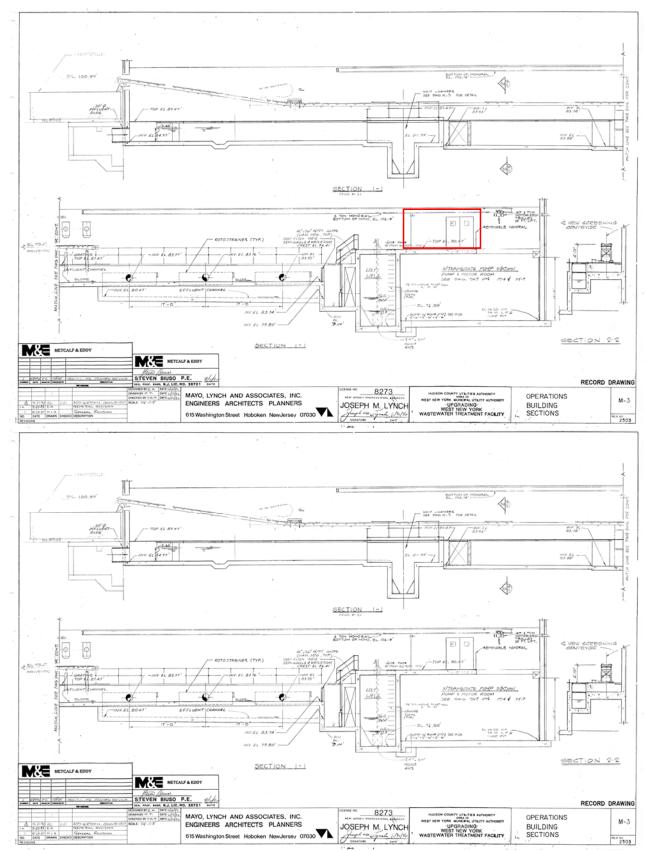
Plant Profile Drawing showing open area in preliminary treatment building
